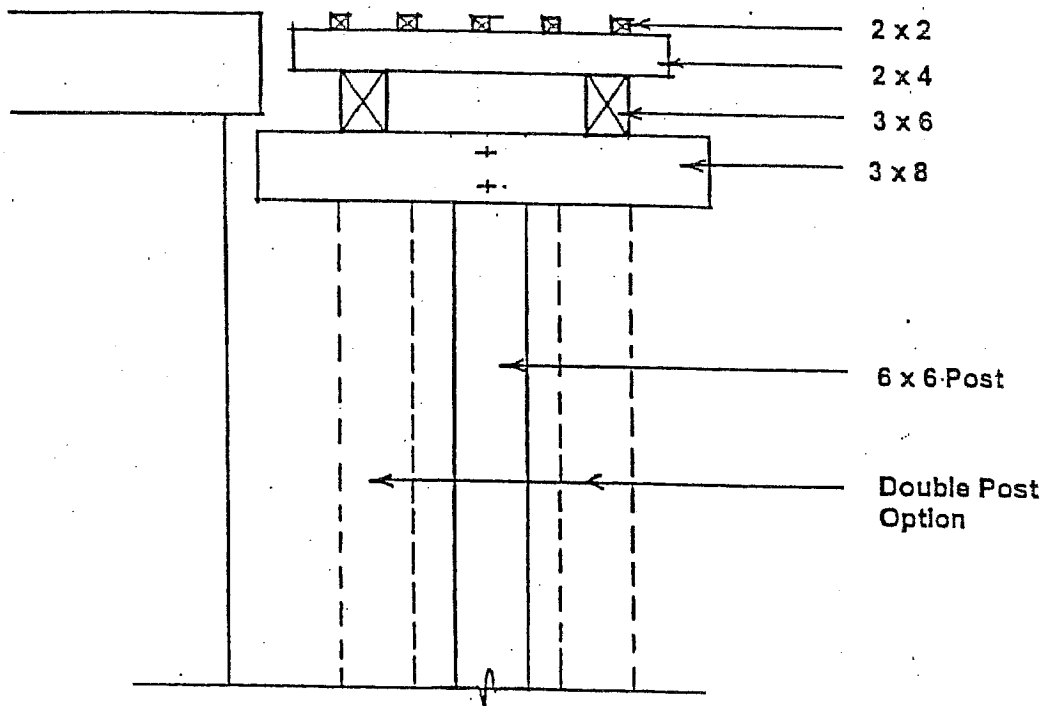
G STANDARD DETAIL - GARAGE
